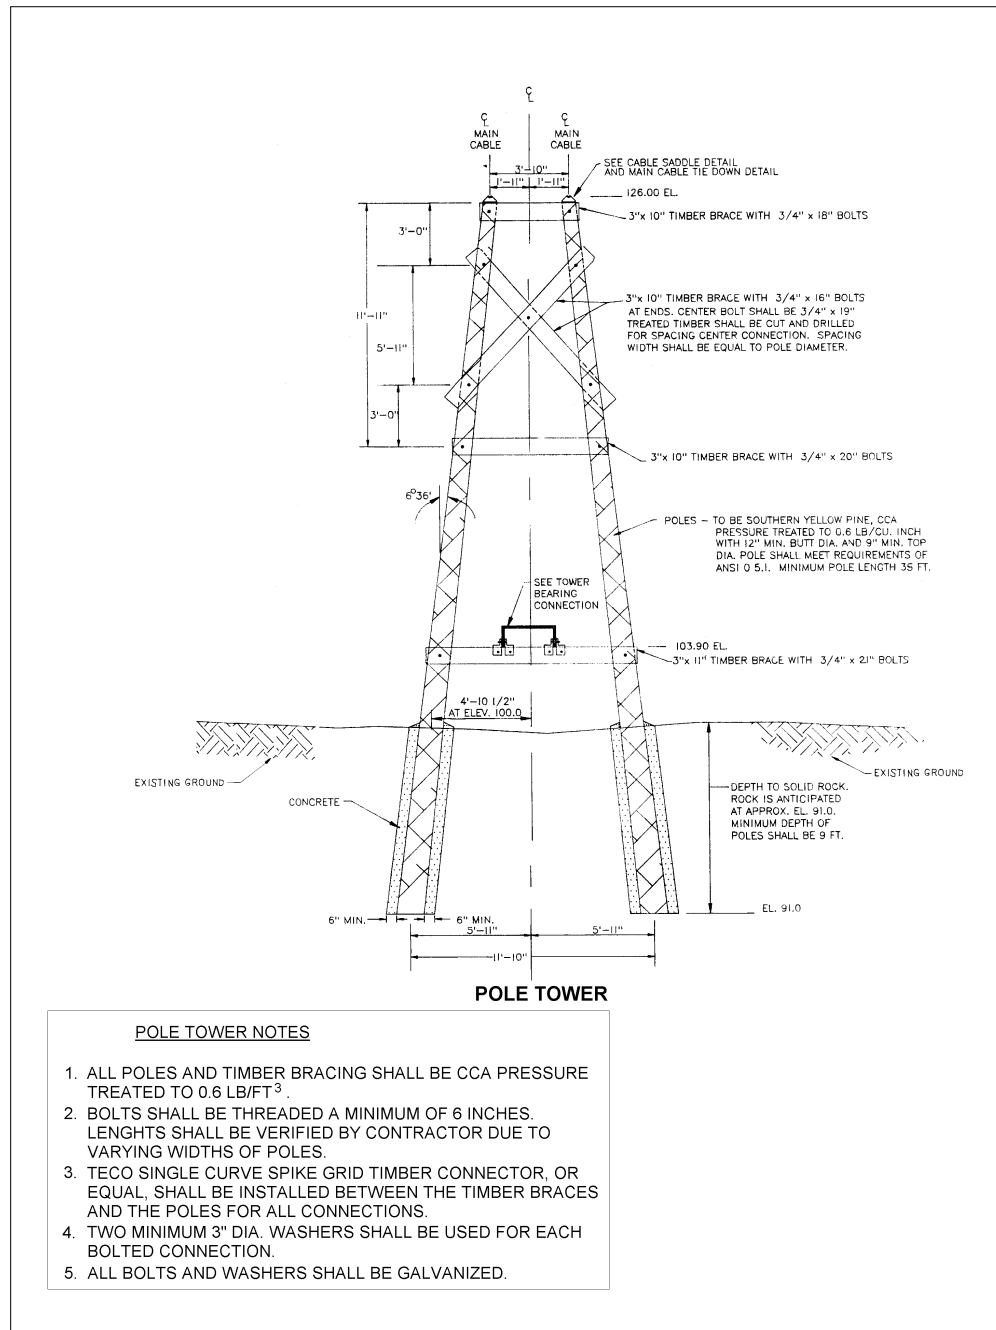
Wallace Tract Bridge Pole Towers, George Washington and Jefferson National Forest. Diagram courtesy of George Washington and Jefferson National Forest Engineering Staff.
